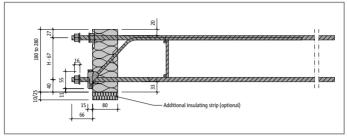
Schöck Isokorb® type KS14-VV: Product cross section
